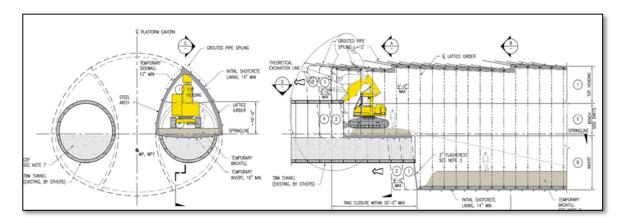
Coordinated construction of the station cavern with the exiting TBM tunnel
